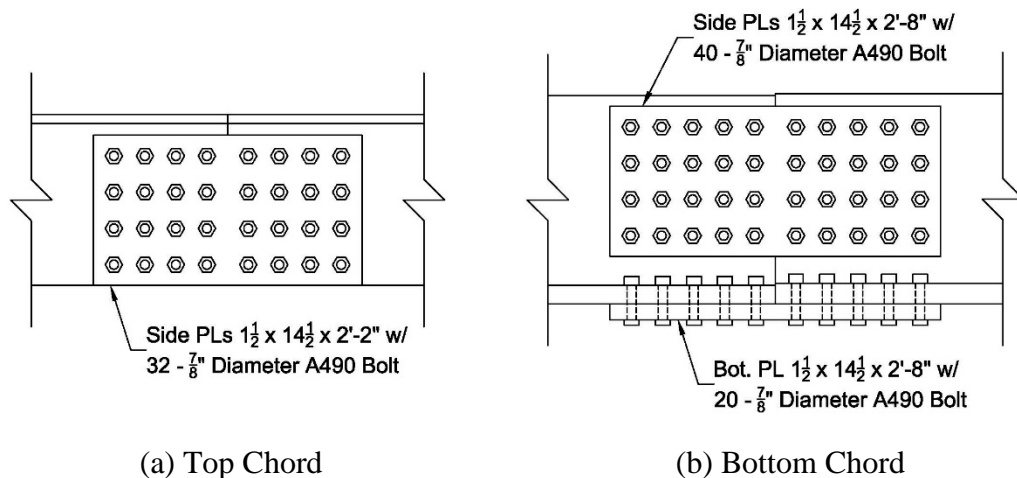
Splice Connection Details for the Two-Splices in Truss 2
